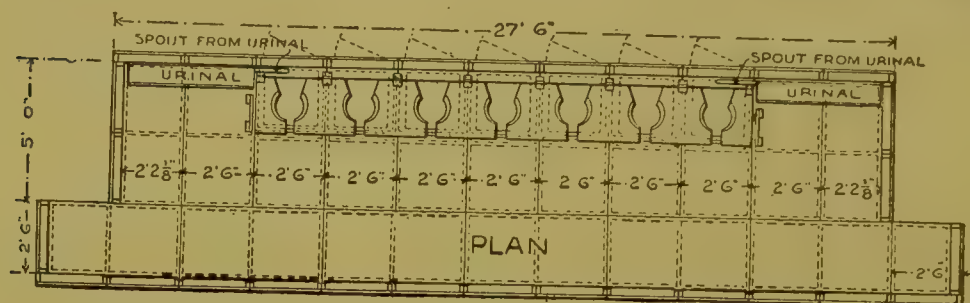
Ground plan of earth-closet latrine. Knock-down system.
